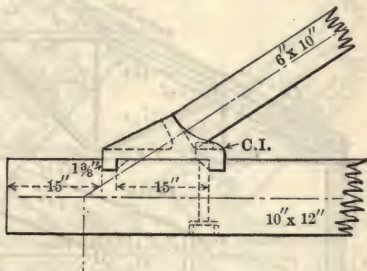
B. Alternate Detail of Joint 1, Fig. 3
